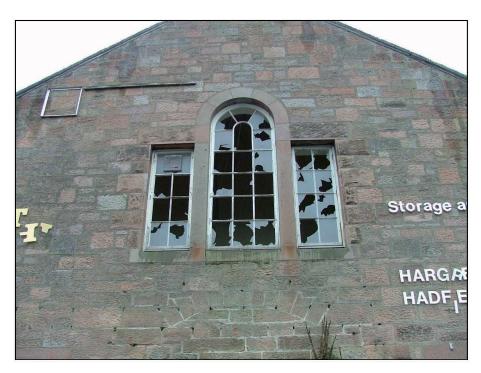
Detail of the Venetian-style window in the east elevation of Building C
